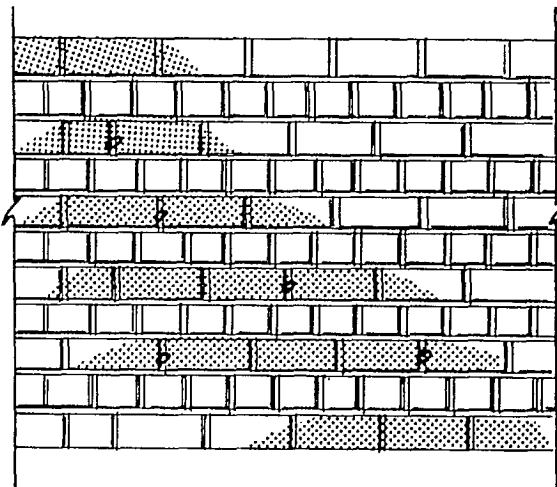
12" BRICK AND BLOCK BONDED MASONRY WALL
